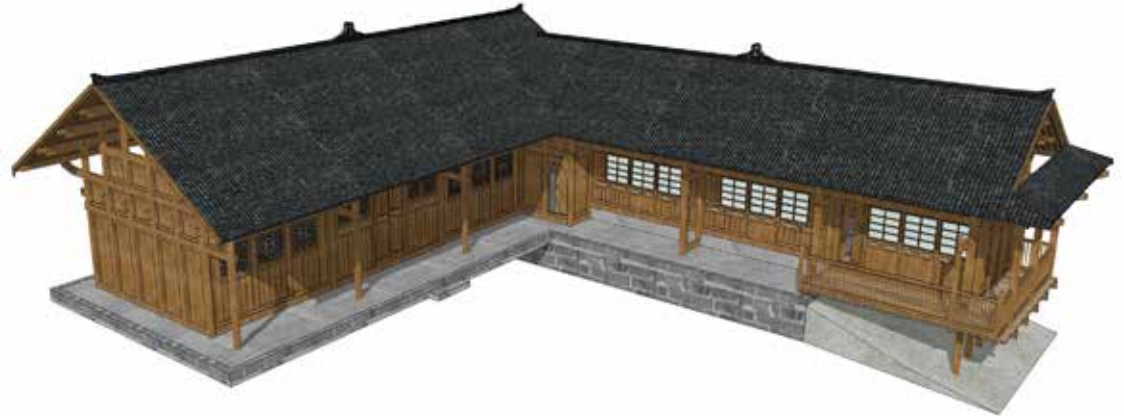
Single-storey Chuandou wooden frame building (source:drawing by author)
